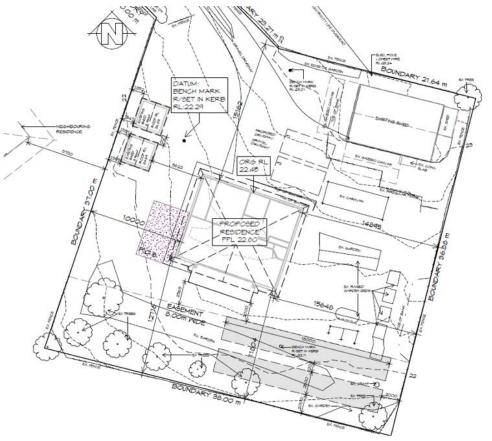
Site plan (from Prime Design drawing PDH24091 -02 04 030625)
